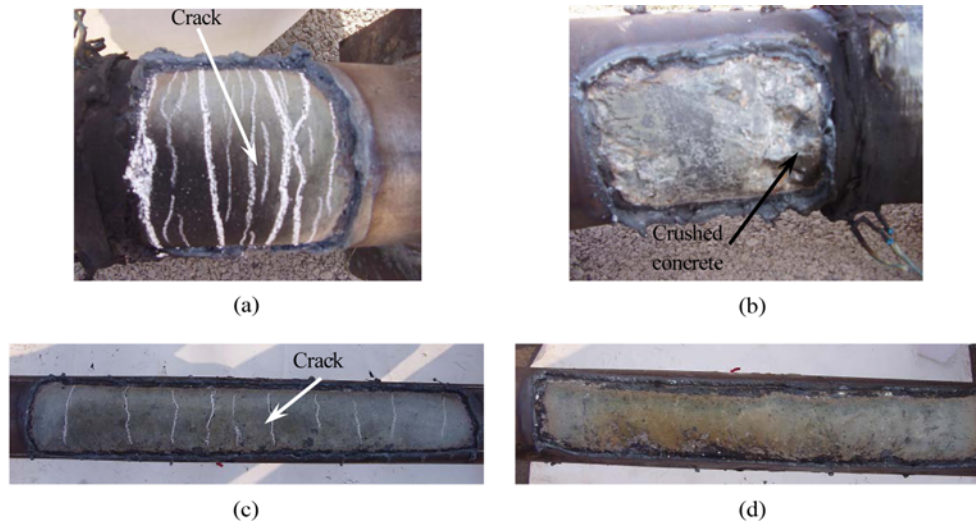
Failure Modes of Concrete inside Specimens: (a) Concrete in Tension Zone of CBC A-80, (b) Concrete in Compression Zone of CBC A-80, (c) Concrete in Tension Zone of CBC H-80, (d) Concrete in Compression Zone of CBC H-80
